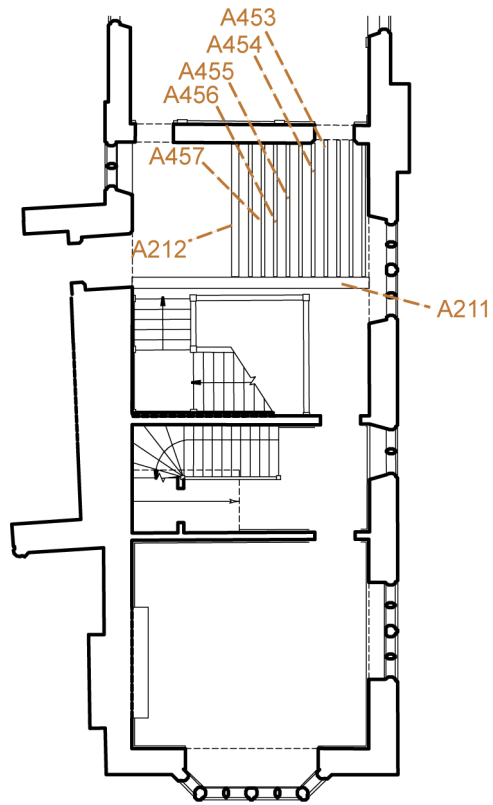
First-floor plan of the southern end of the East range, showing the locations of samples APT-A211–12 and A453–7
